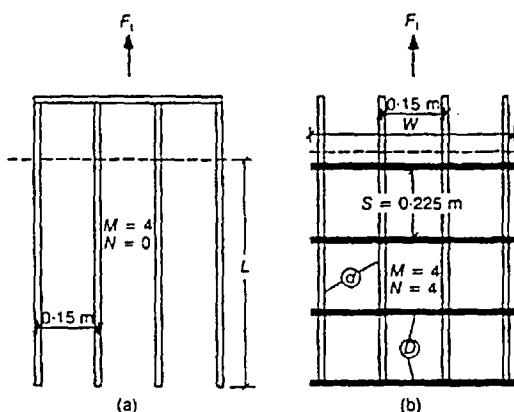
Types of reinforcement used in the laboratory pullout tests
